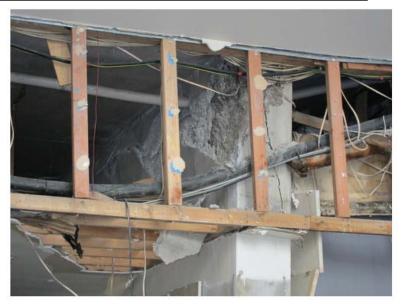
Shearwall D5-6 - Hingeing at top of ground floor
